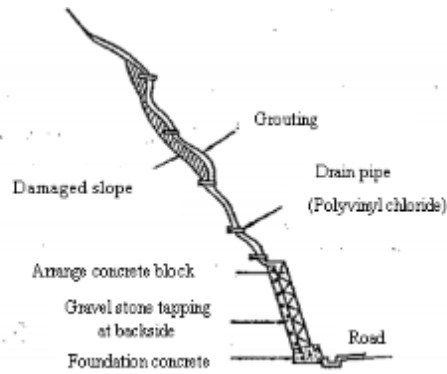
Cross section of collapse of mortar stabilized slope
